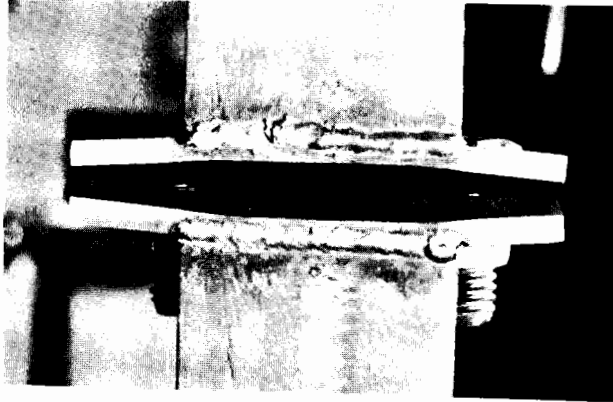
OPENING OF THE BUTT PLATES ABOUT THE WEAK AXIS OF BENDING
